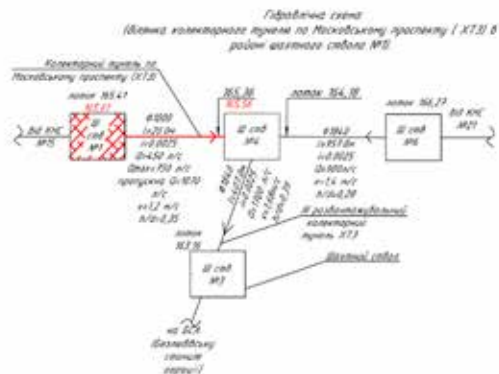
Hydraulic diagram showing the tunnel sewer sections adjacent to pit shaft No. 1
